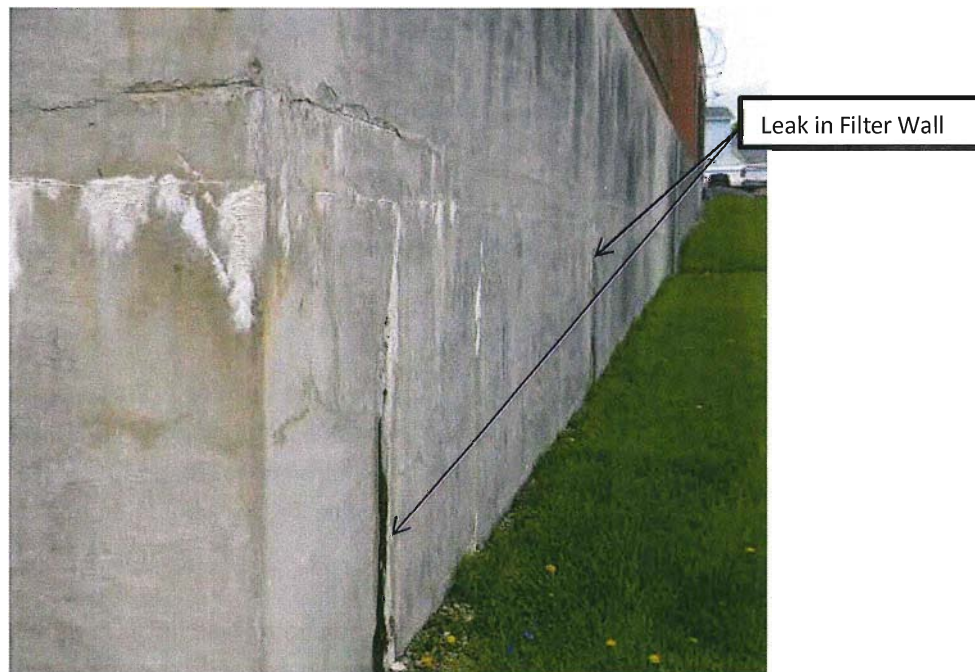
Exterior Wall of Filter on North Side of Filter Building
